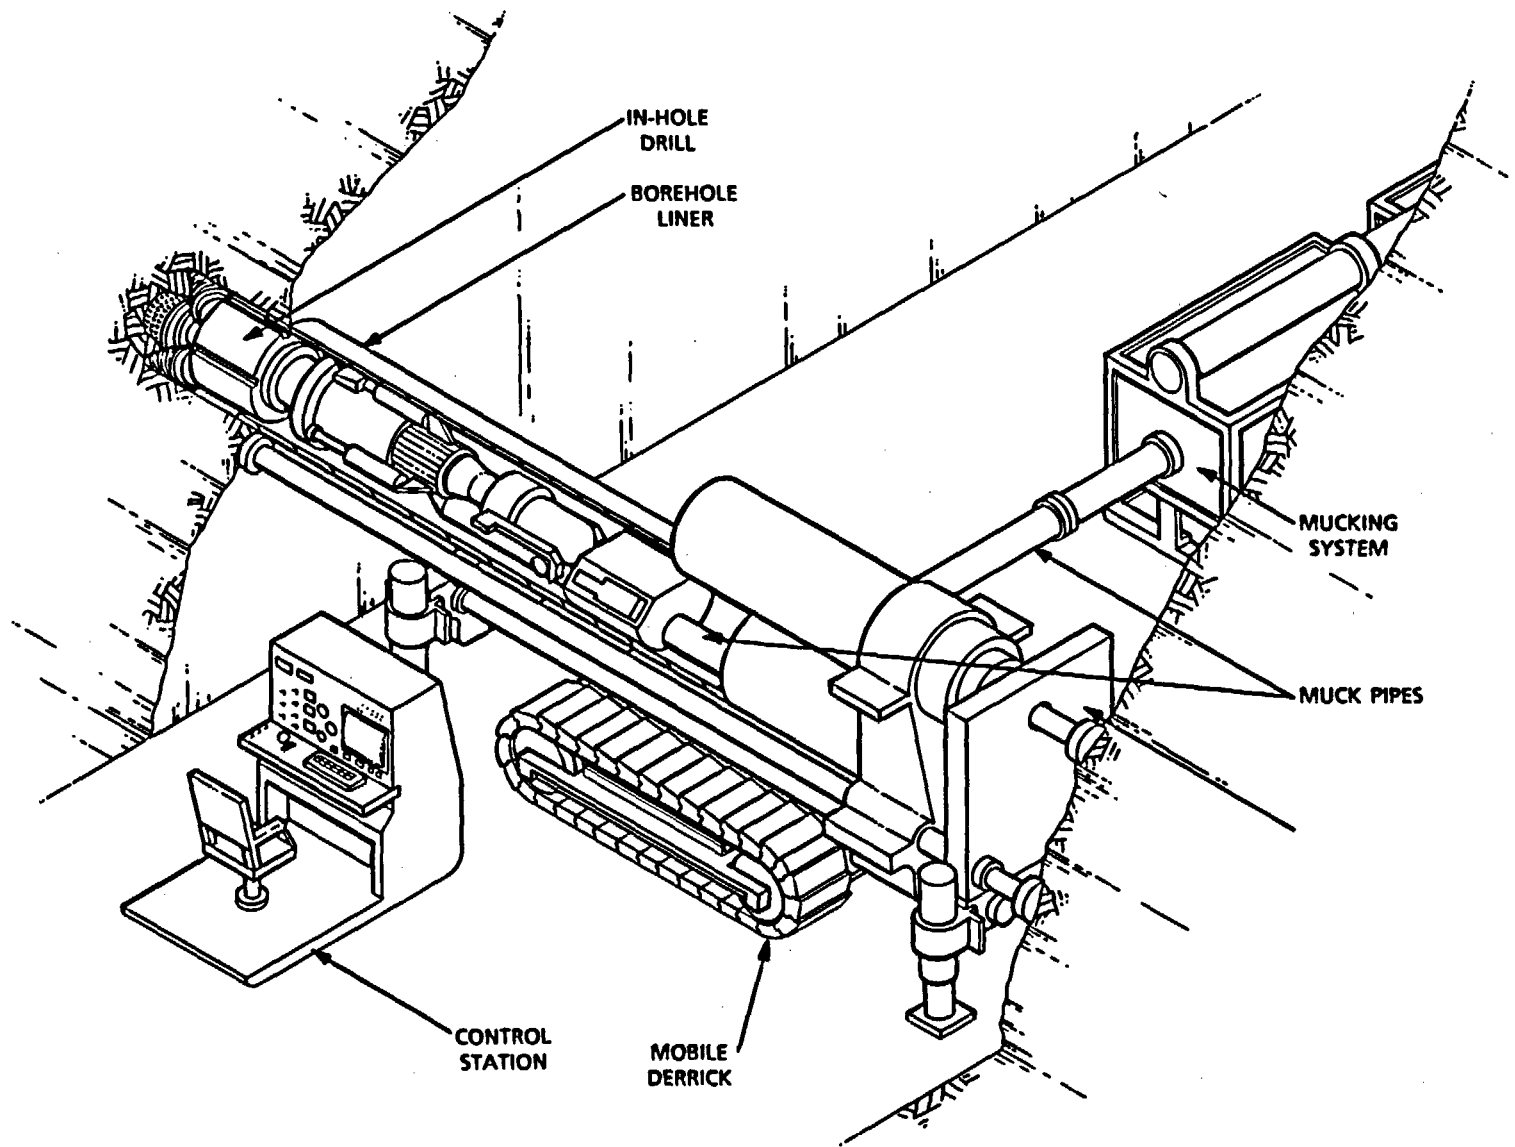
Horizontal Borehole Drilling and Lining Machine
